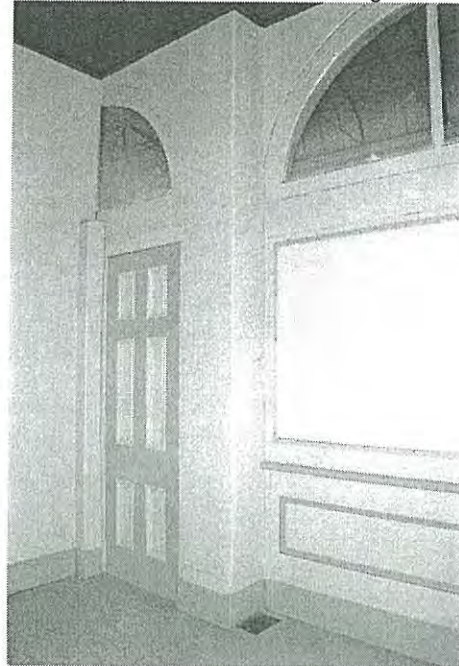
Interior, Ladies' Toilets (space B08a). View looking south-east showing introduced panellled timber and glazed arcade partition and appropriate six panellled timber door.
